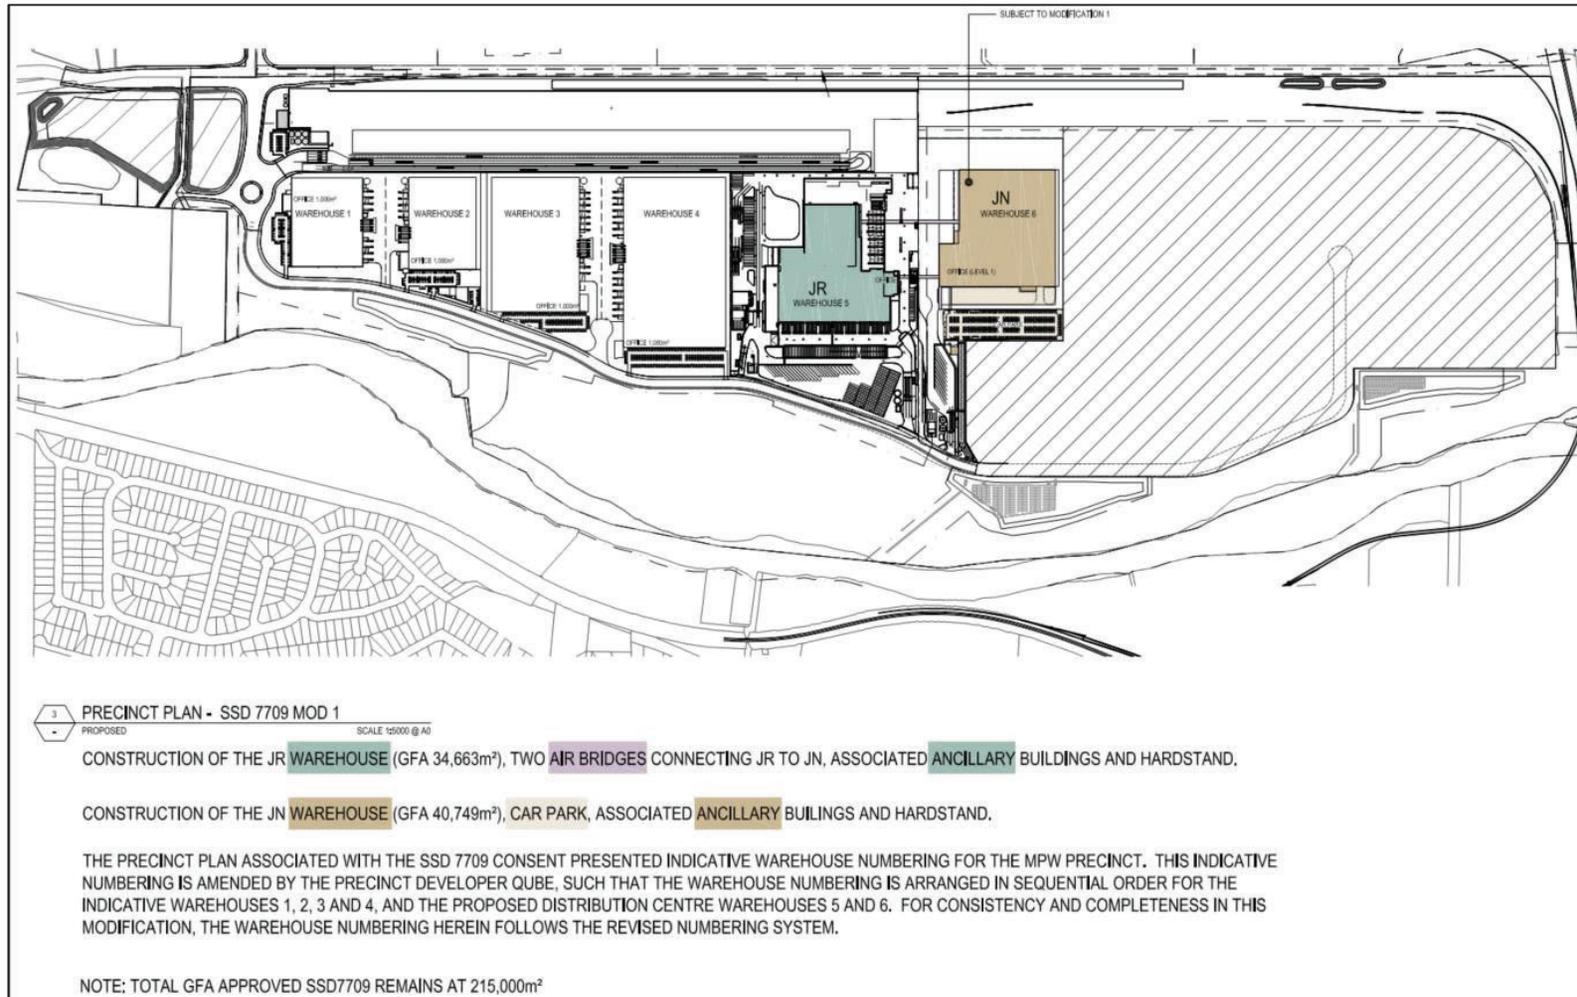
Proposed Precinct Plan across MPW Stage 2 as a Result of the Proposed Modifications (Source: Bell Architecture, 2020)
